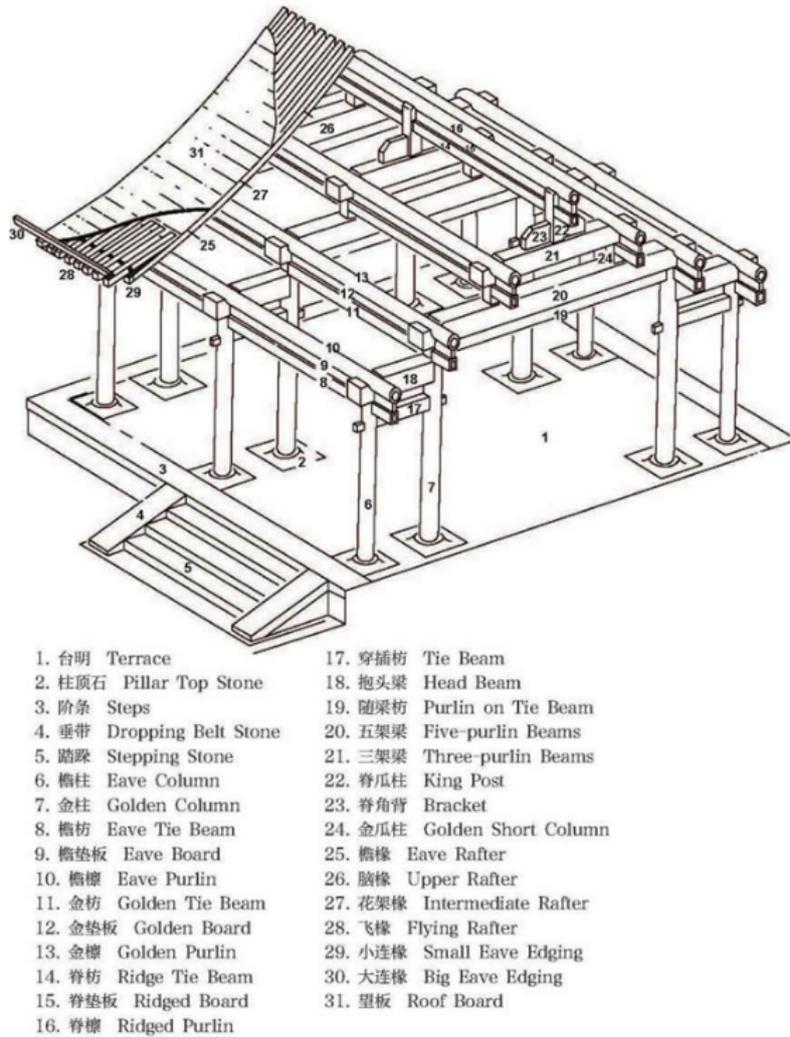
Structural system of the post-and-lintel timber framework (tailiang style), featuring ridge beams, king posts, and multiple horizontal components.
